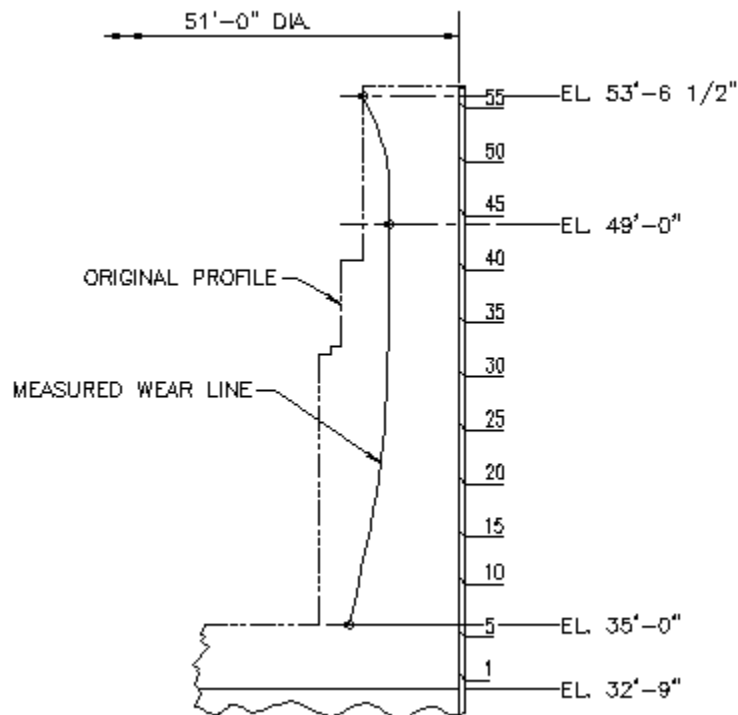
Typical Section through the Hearth Wall outside the Taphole Area
